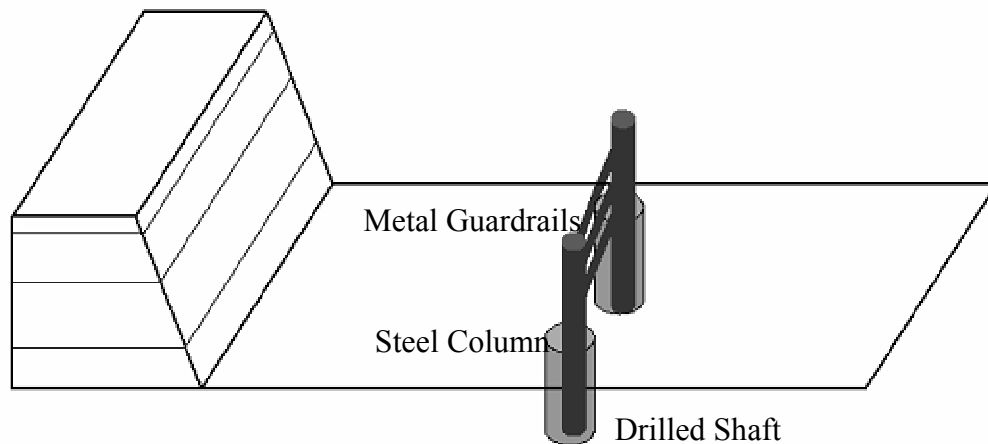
Illustration of the Pile Retaining Wall Reinforced Embankment Before Placement of Soil Mass
